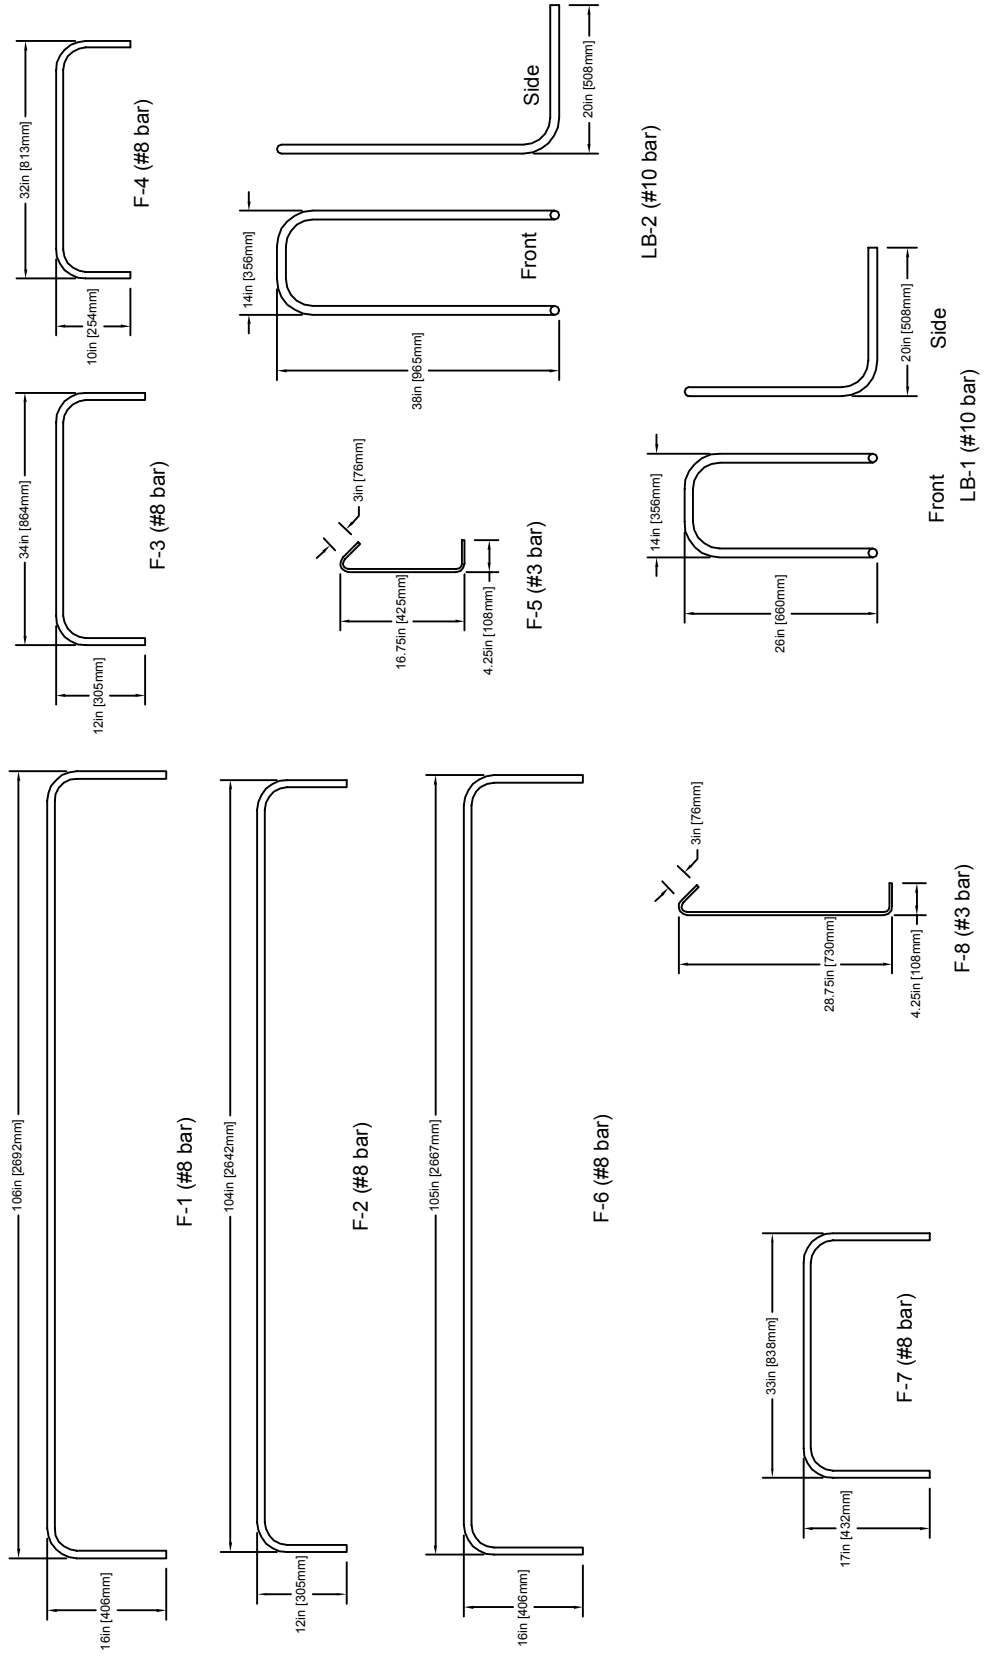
Bridge Plans Sheet 23; Steel Details 5.
